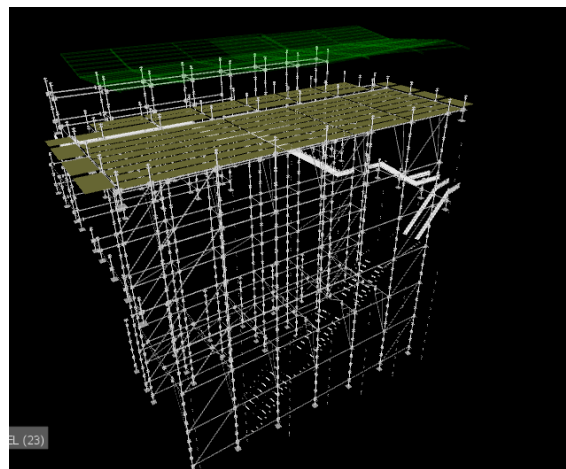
Scaffold Erected with Planks and Ceiling Framing to Begin
